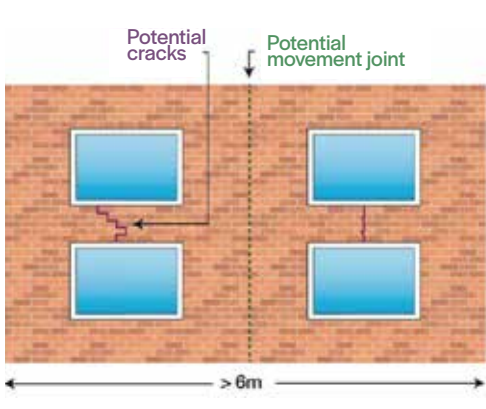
A long uninterrupted run of brickwork between upper and lower windows can lead to cracking at the smallest height, i.e. between the windows either as shown or from the corners of the windows. Cracks may be vertical or stepped – they follow the line of least resistance.
